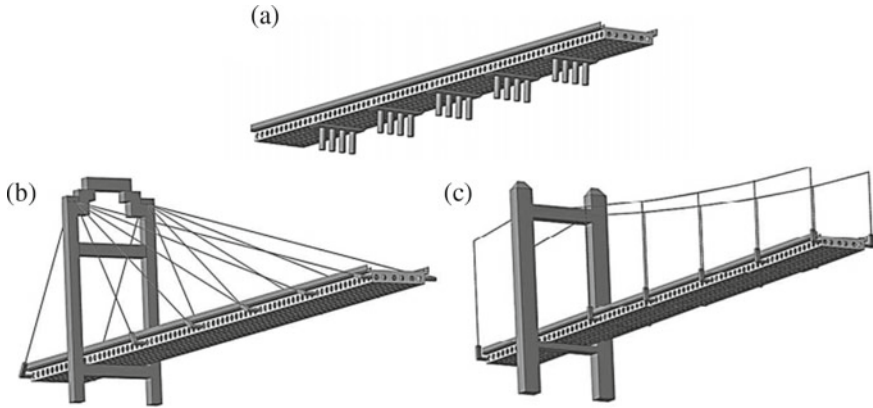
Variants of bridges of different systems with the proposed span structure: a a fragment of the plate-girder bridge; b a fragment of the cable-stayed bridge; c a fragment of the suspension bridge
